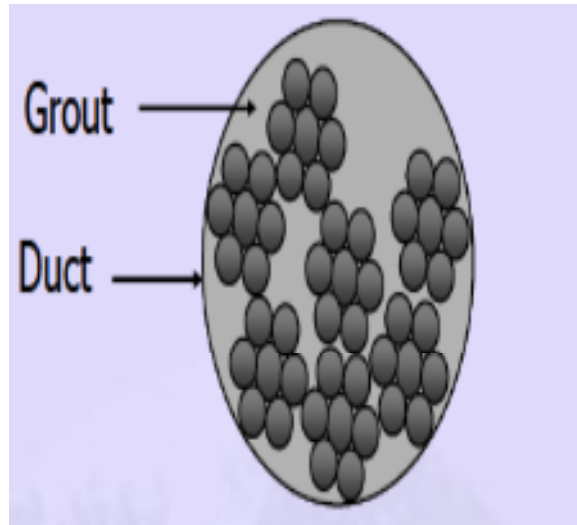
Cross-section of a typical tendon [Amlan et al. (section 1.7)]
